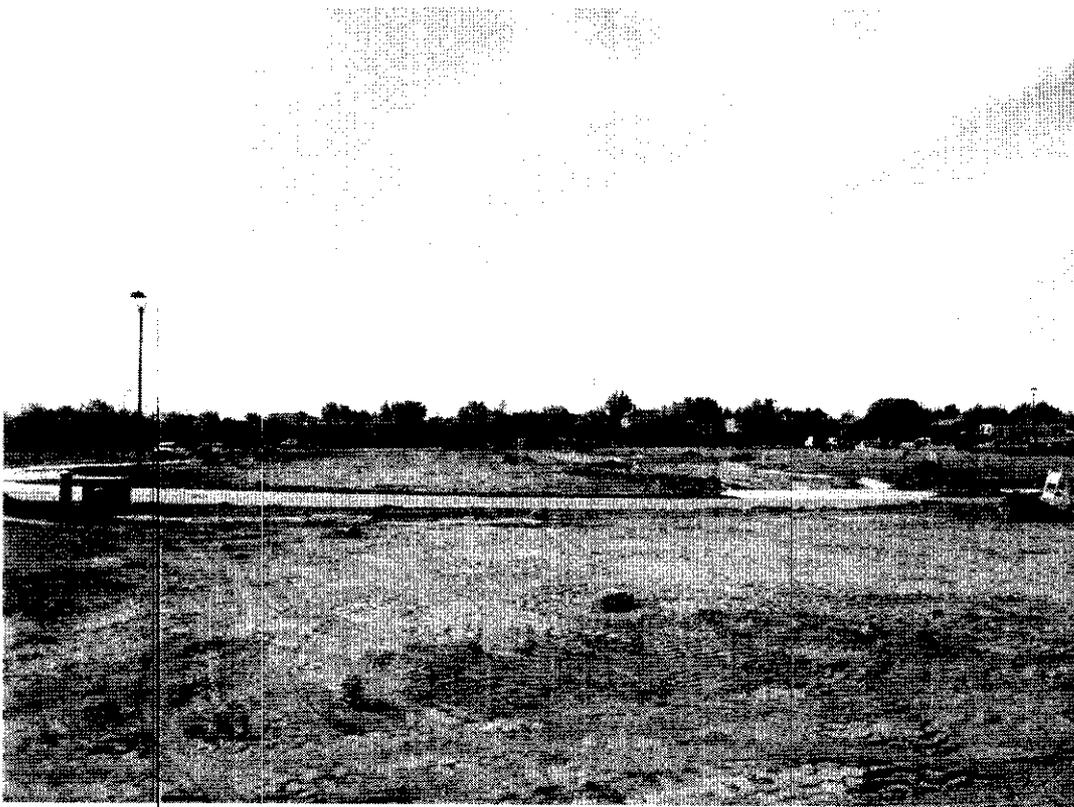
Looking east across site (Tracts B-2 & B-3)
